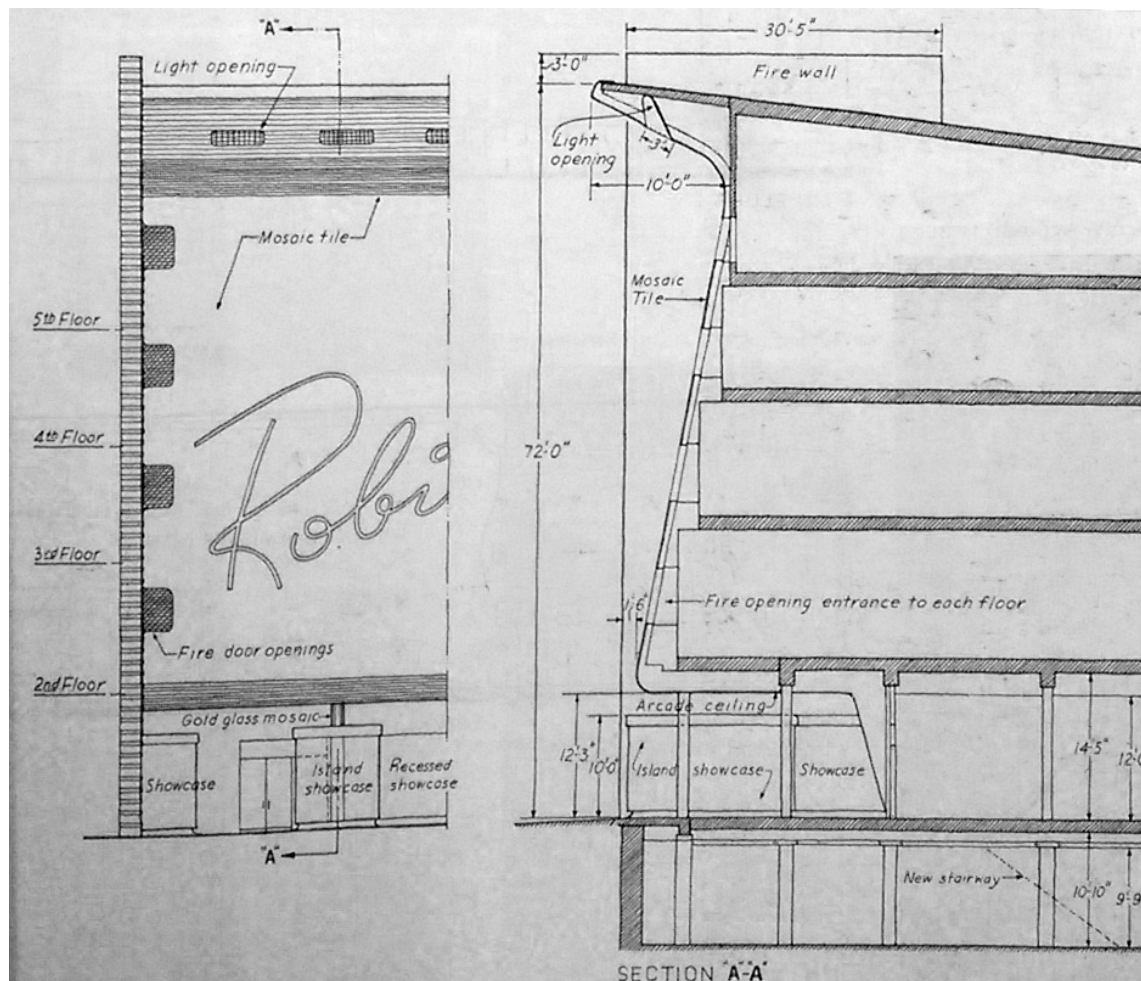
Original elevation and section (Architectural Forum, July 1947).
